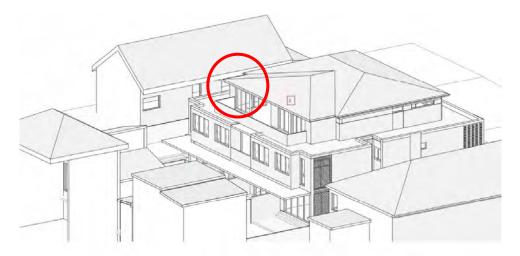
View from the sun at 3pm on 21 June impacting on existing window at No. 22 Allens Parade
